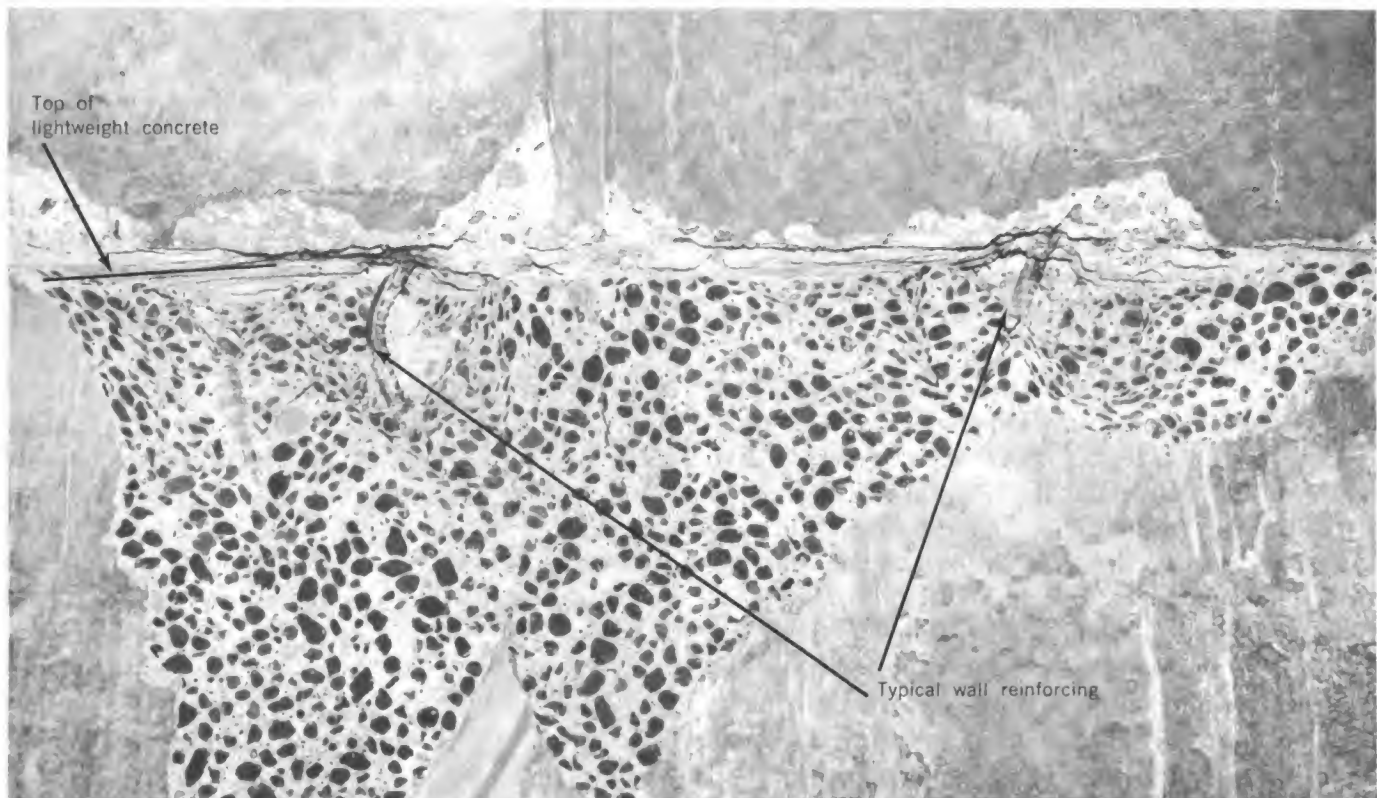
Museum for Antique Cars. Fracture joint at first floor in north wall.
